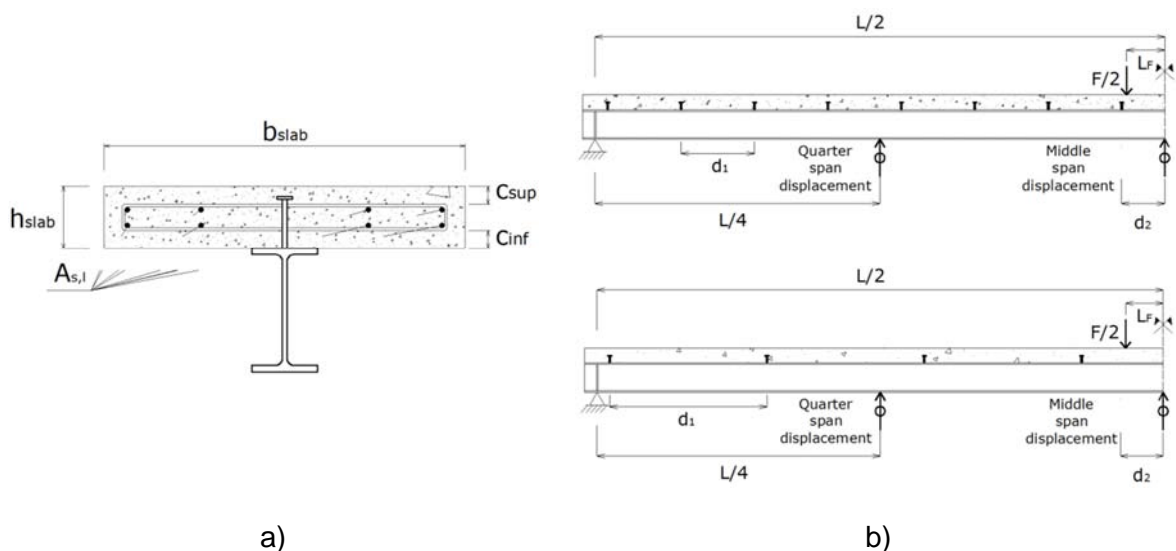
Scheme of tested beam, adapted from Valente [188]: a) transversal; b) longitudinal (half span).
